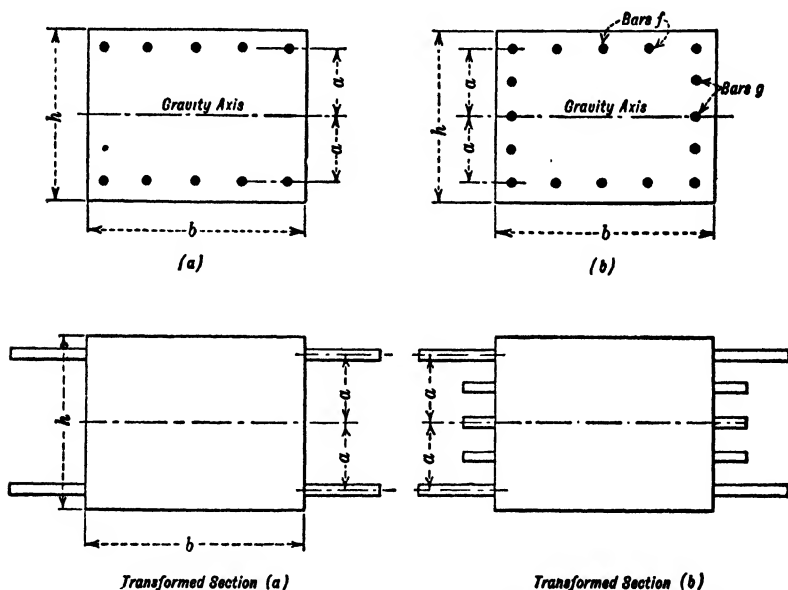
Arrangement of Bars in Rectangular Section. (See p. 174.)
